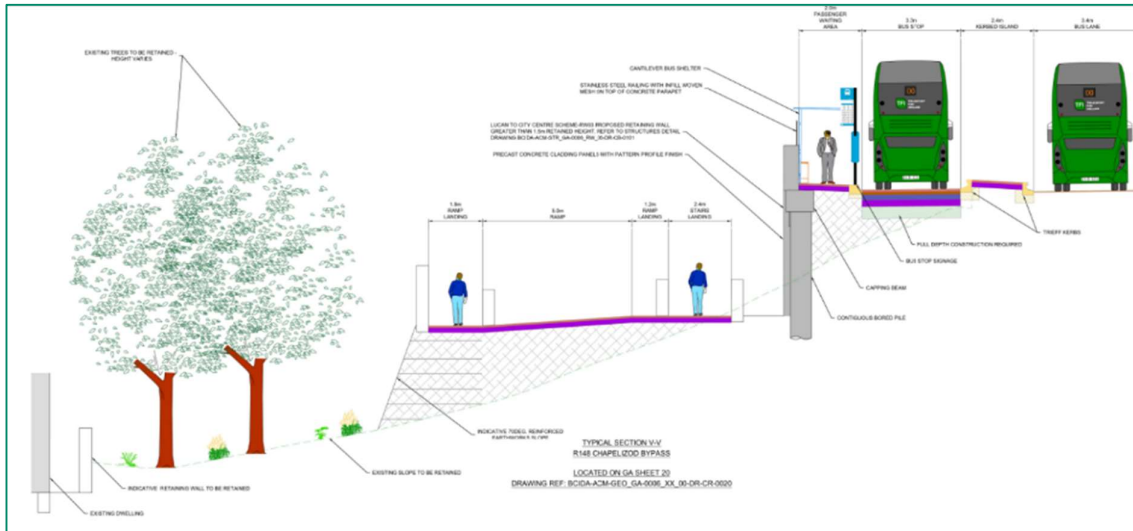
Typical Cross-section Adjacent to Knockmaree Apartments
